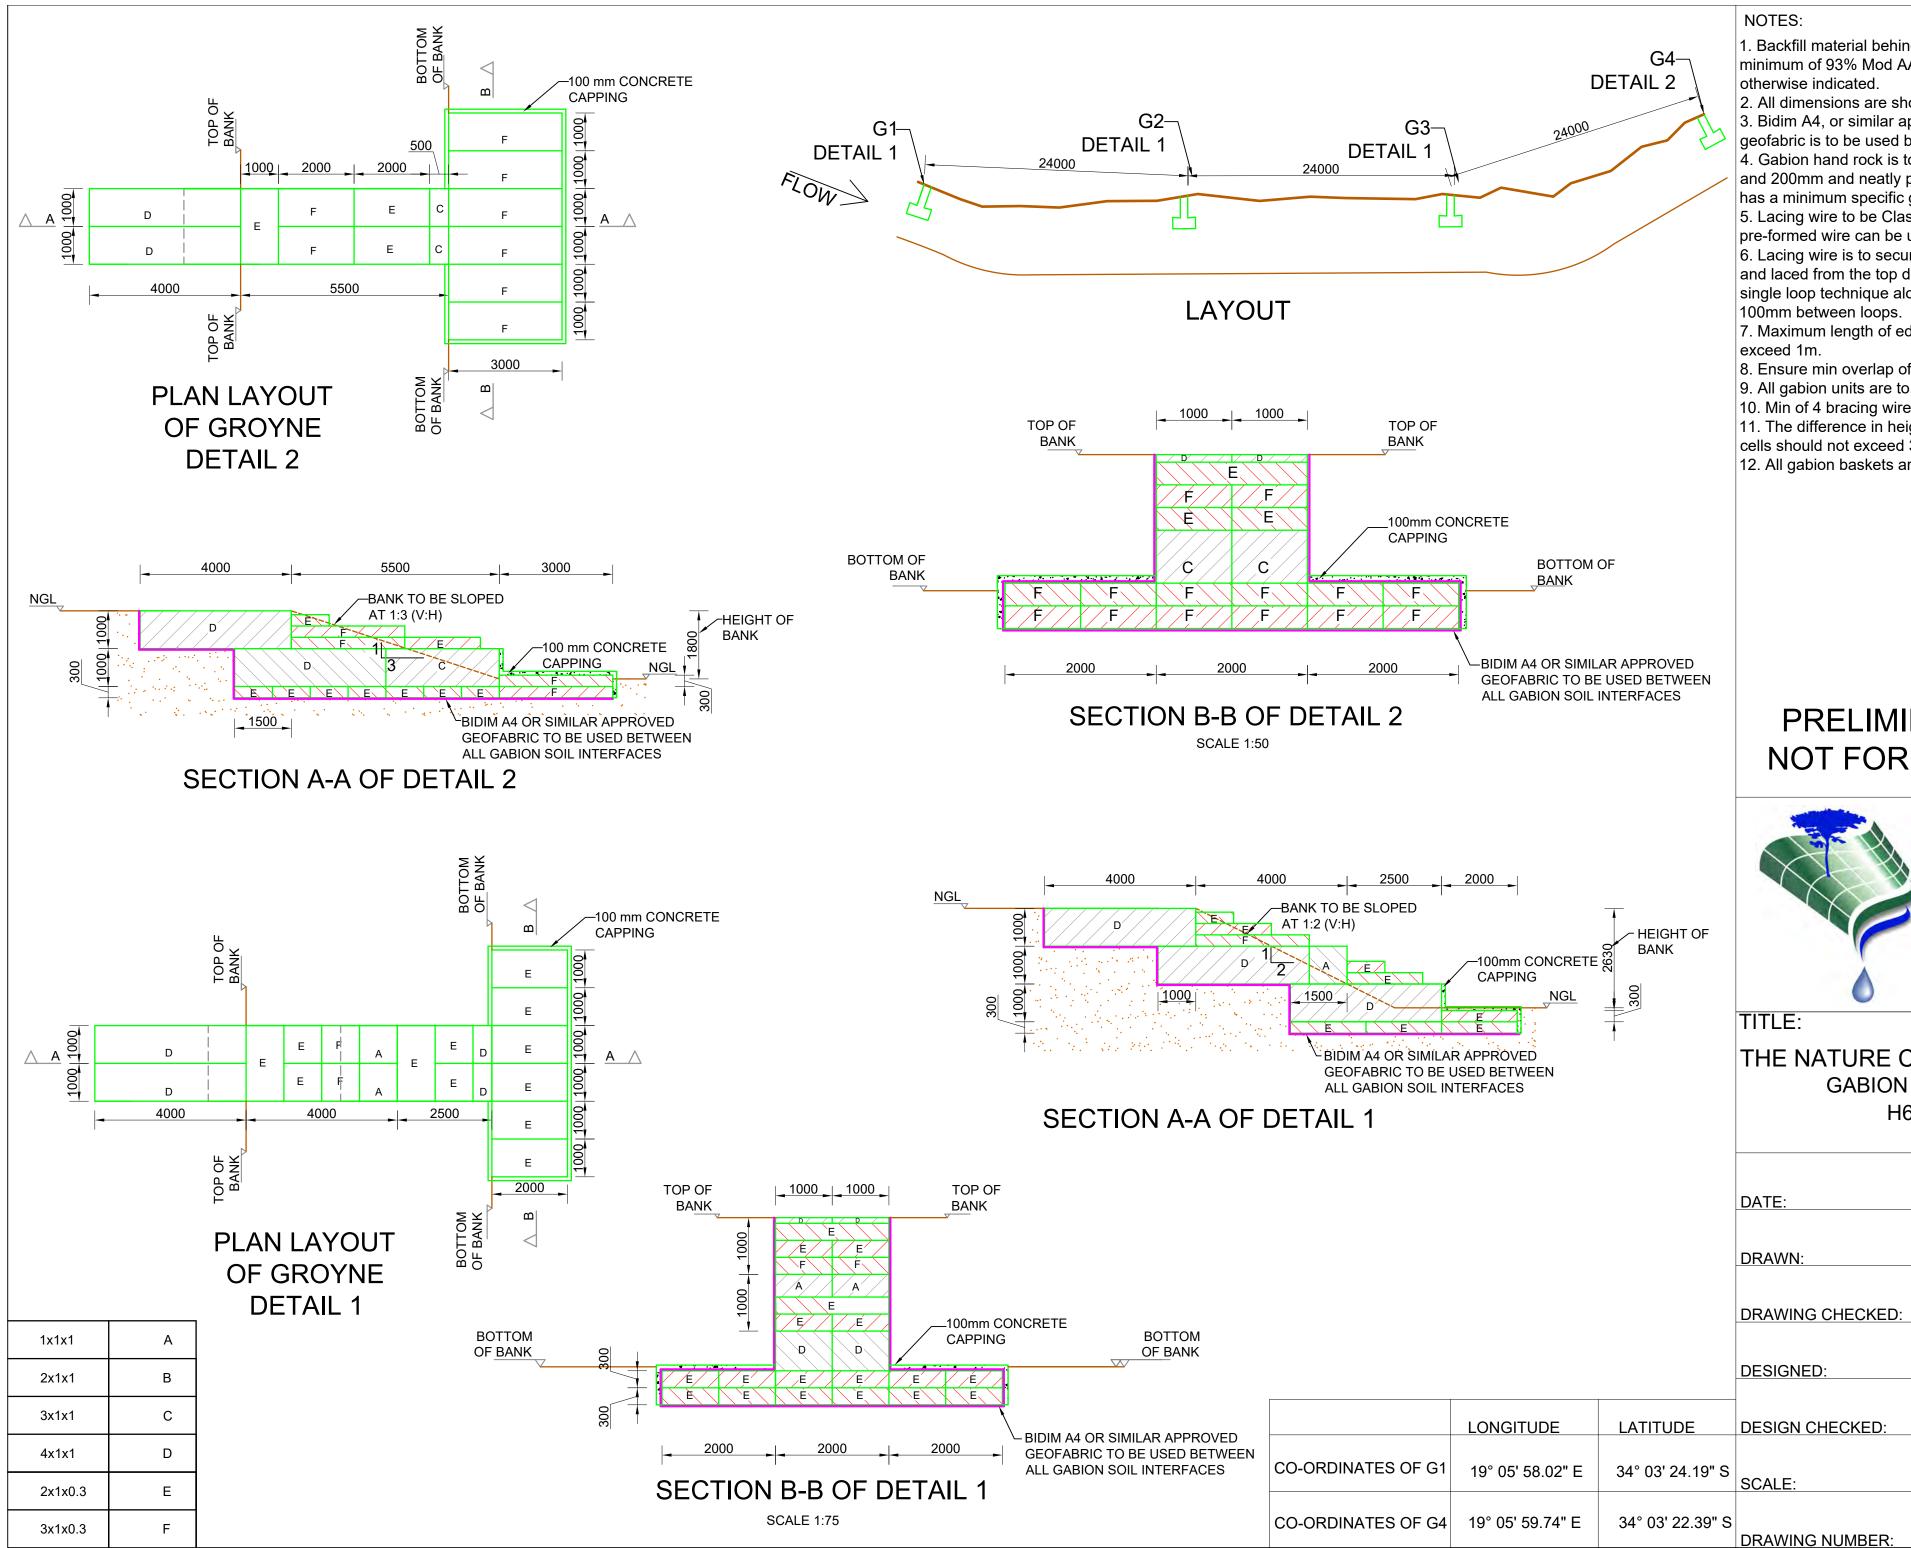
Proposed unstable bank to be stabilised with sloping and installation of groynes
